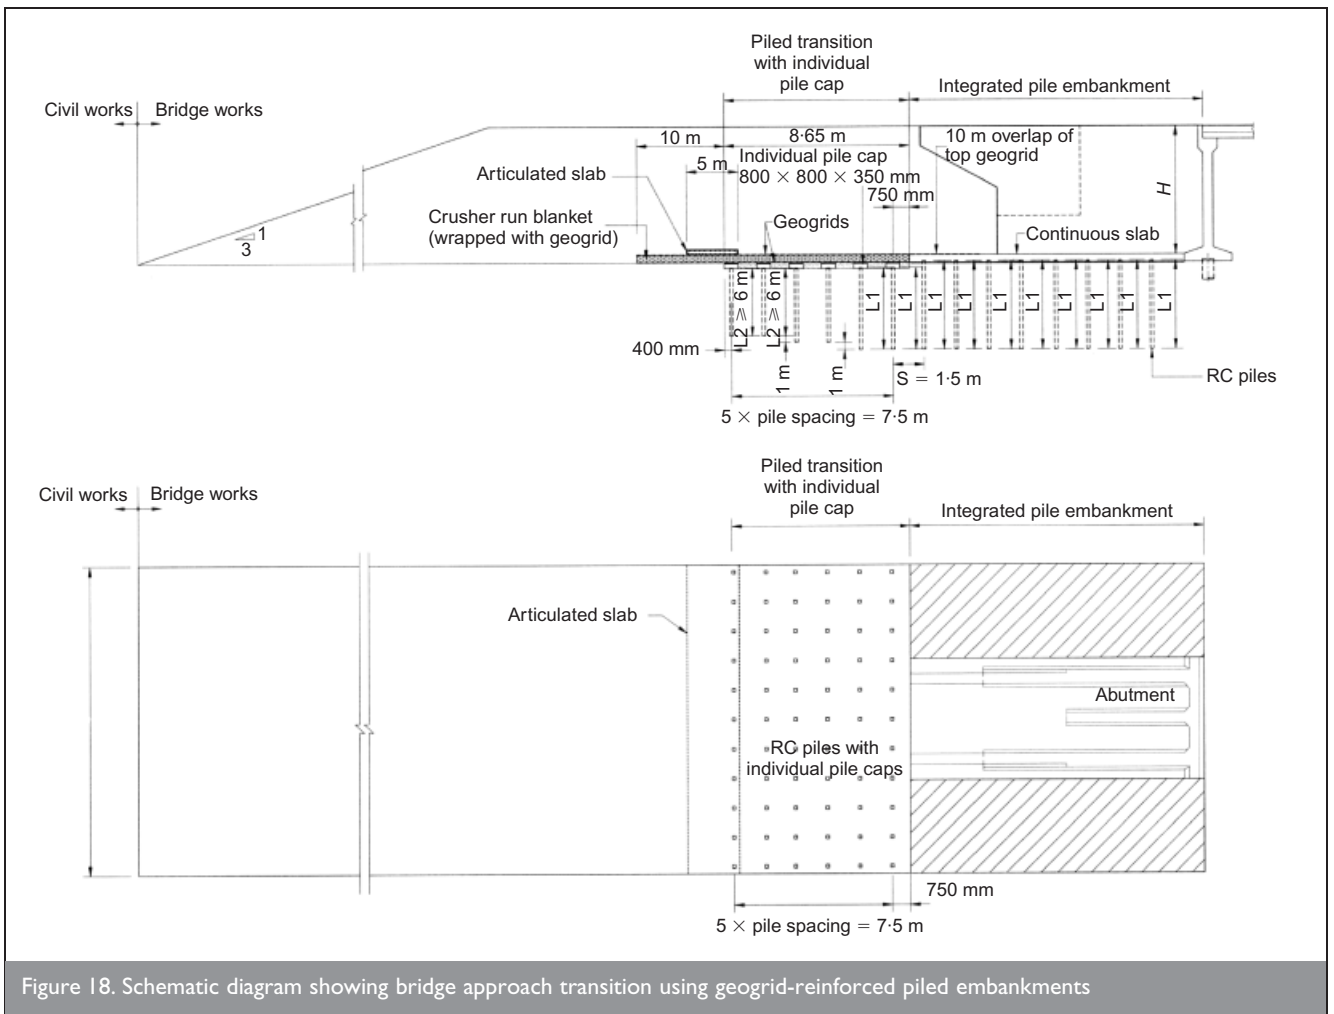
Schematic diagram showing bridge approach transition using geogrid-reinforced piled embankments
